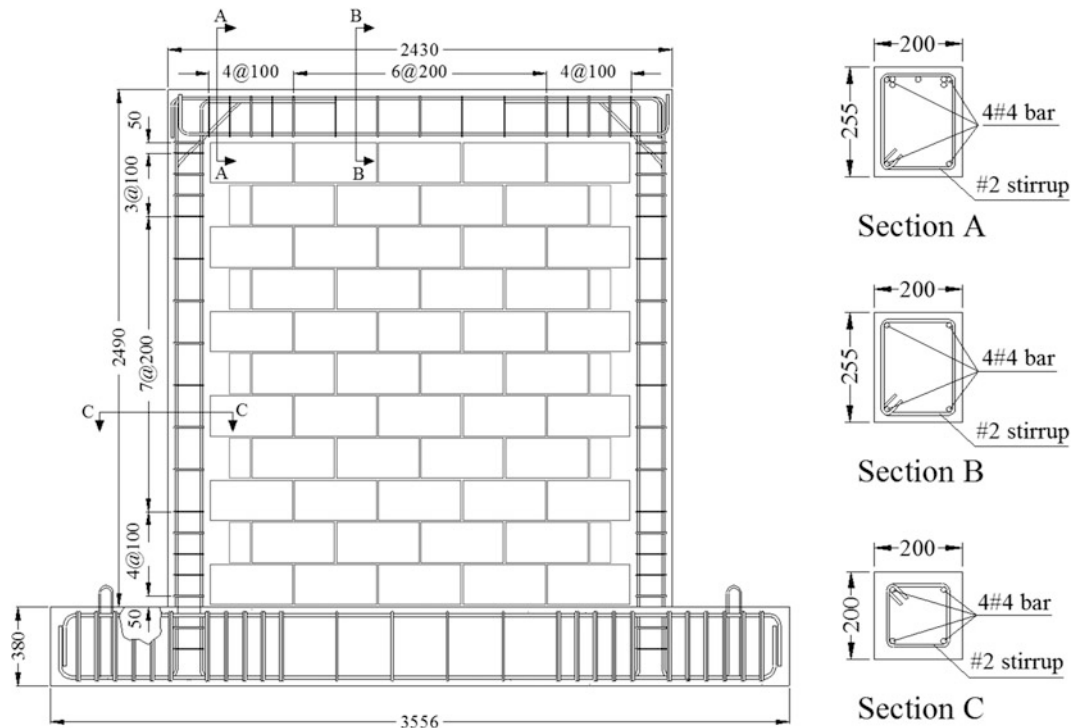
Specimen WU: geometry and RC reinforcement layout (dimension in mm)
